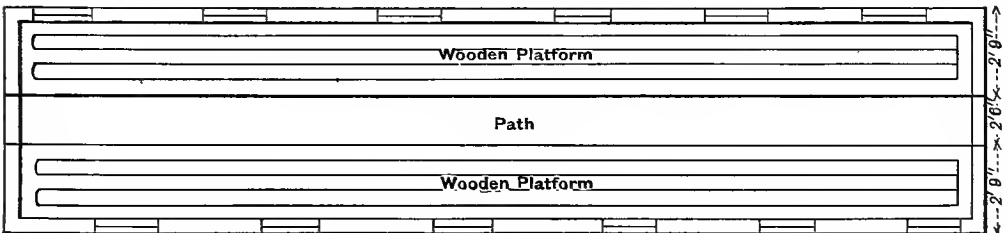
Ground-plan at Level of Platform. (The lines show the pipes.)
